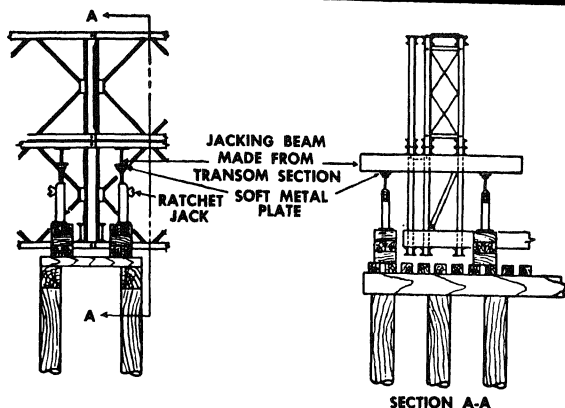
Jacking over intermediate pier—two jacks, one on each side of girder, push on beam under top chord of lower story.
